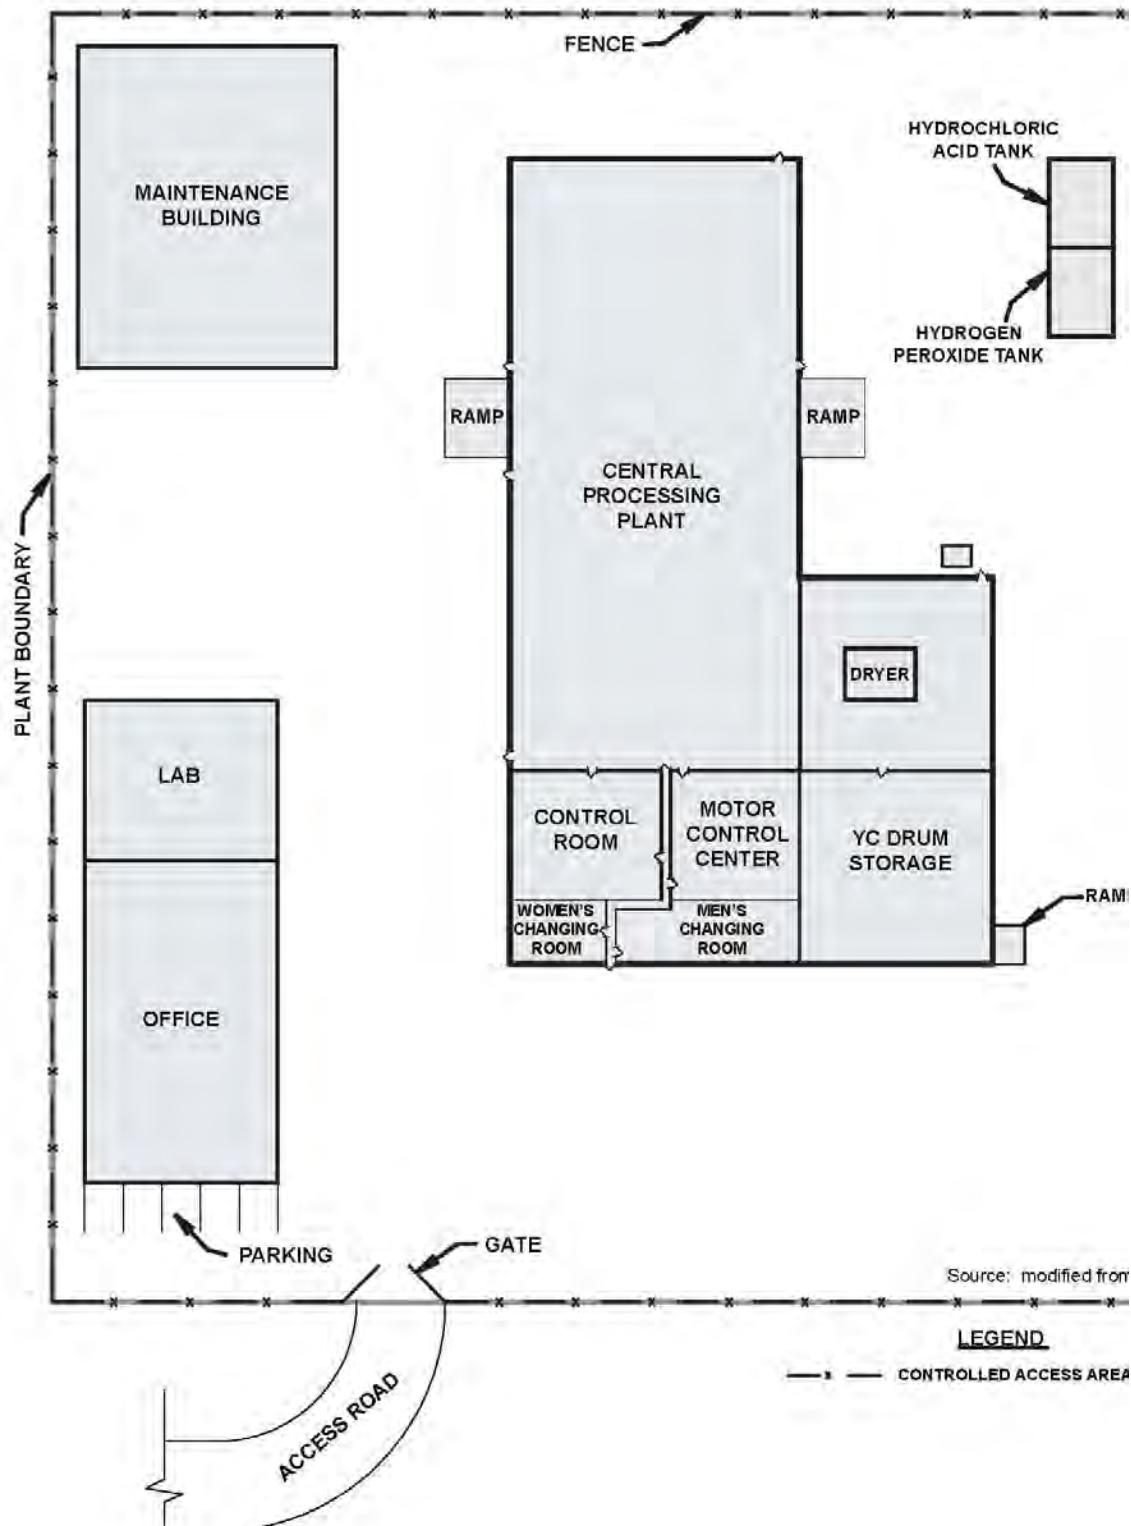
General Layout of the Nichols Ranch Unit Buildings
